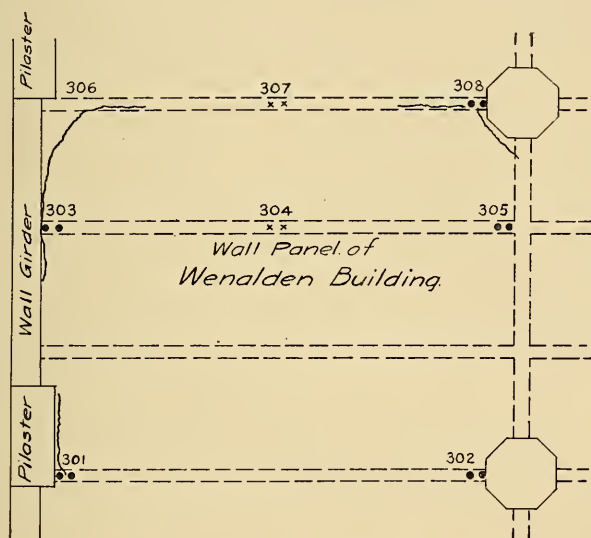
WALL PANEL TEST; PLAN SHOWING LOCATION OF GAUGE LINES.
